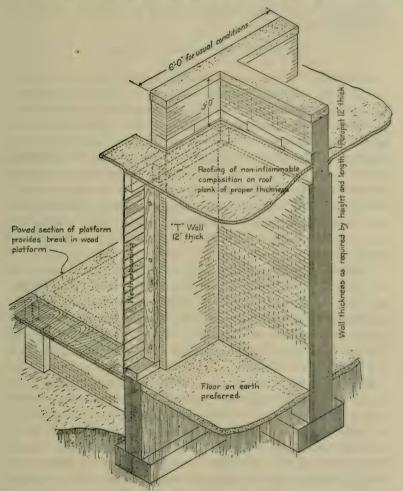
Method of forming fire stop by division fire wall without obstruction to platforms.
